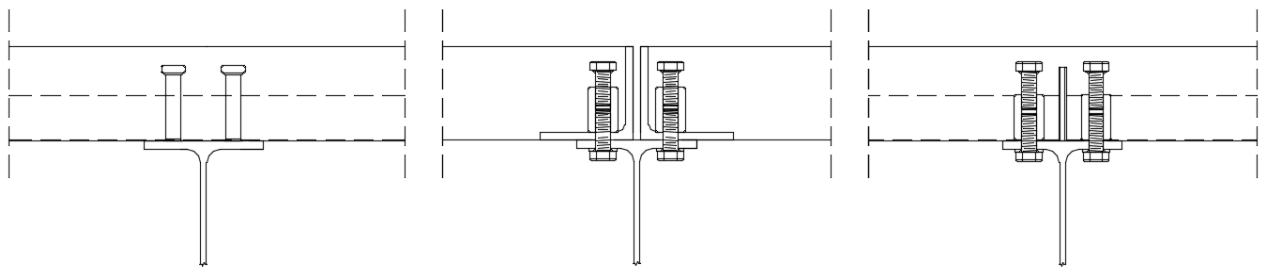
Cross-section of composite beams (1 to 3 from left to right)
